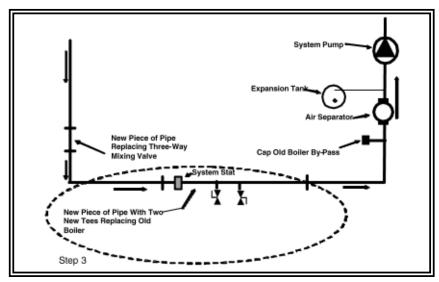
Step 3 - Remove Old Cast Iron Boiler
